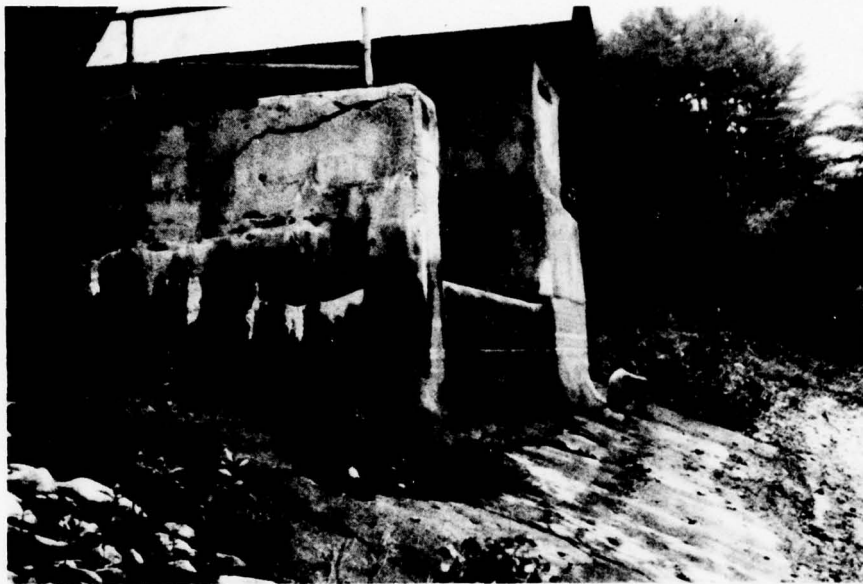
OVERFLOW SPILLWAY AND GATE HOUSE
